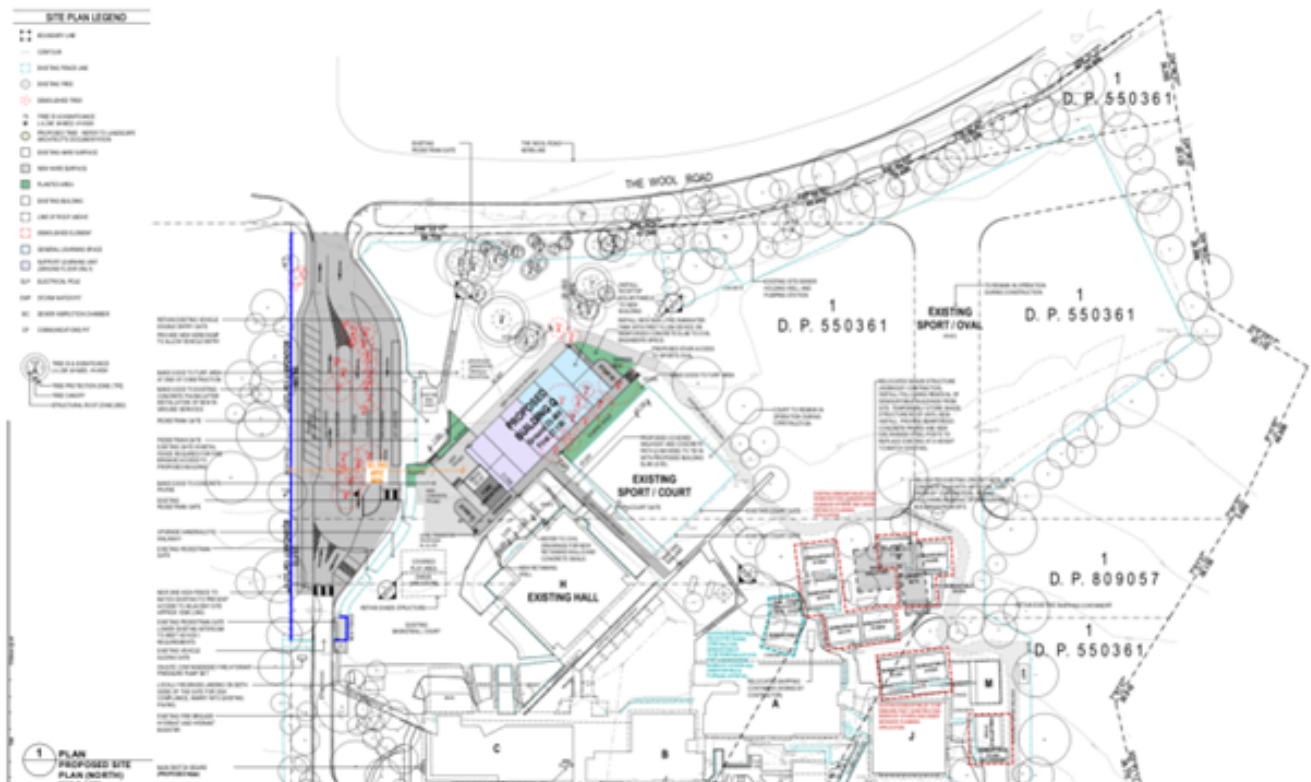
Site Plan (Source: Fulton Trotter 2025)
